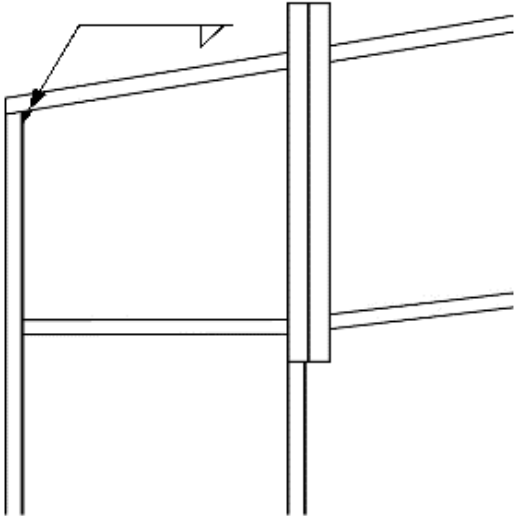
Welds on the exterior corner of panel zone flanges
